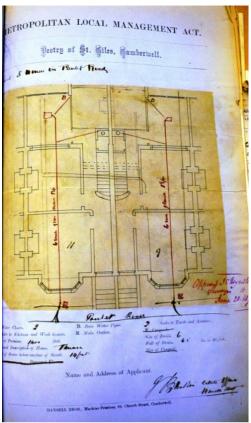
Plan for building application to the District Surveyor for 9 & 11 Paulet Road, 1874.
